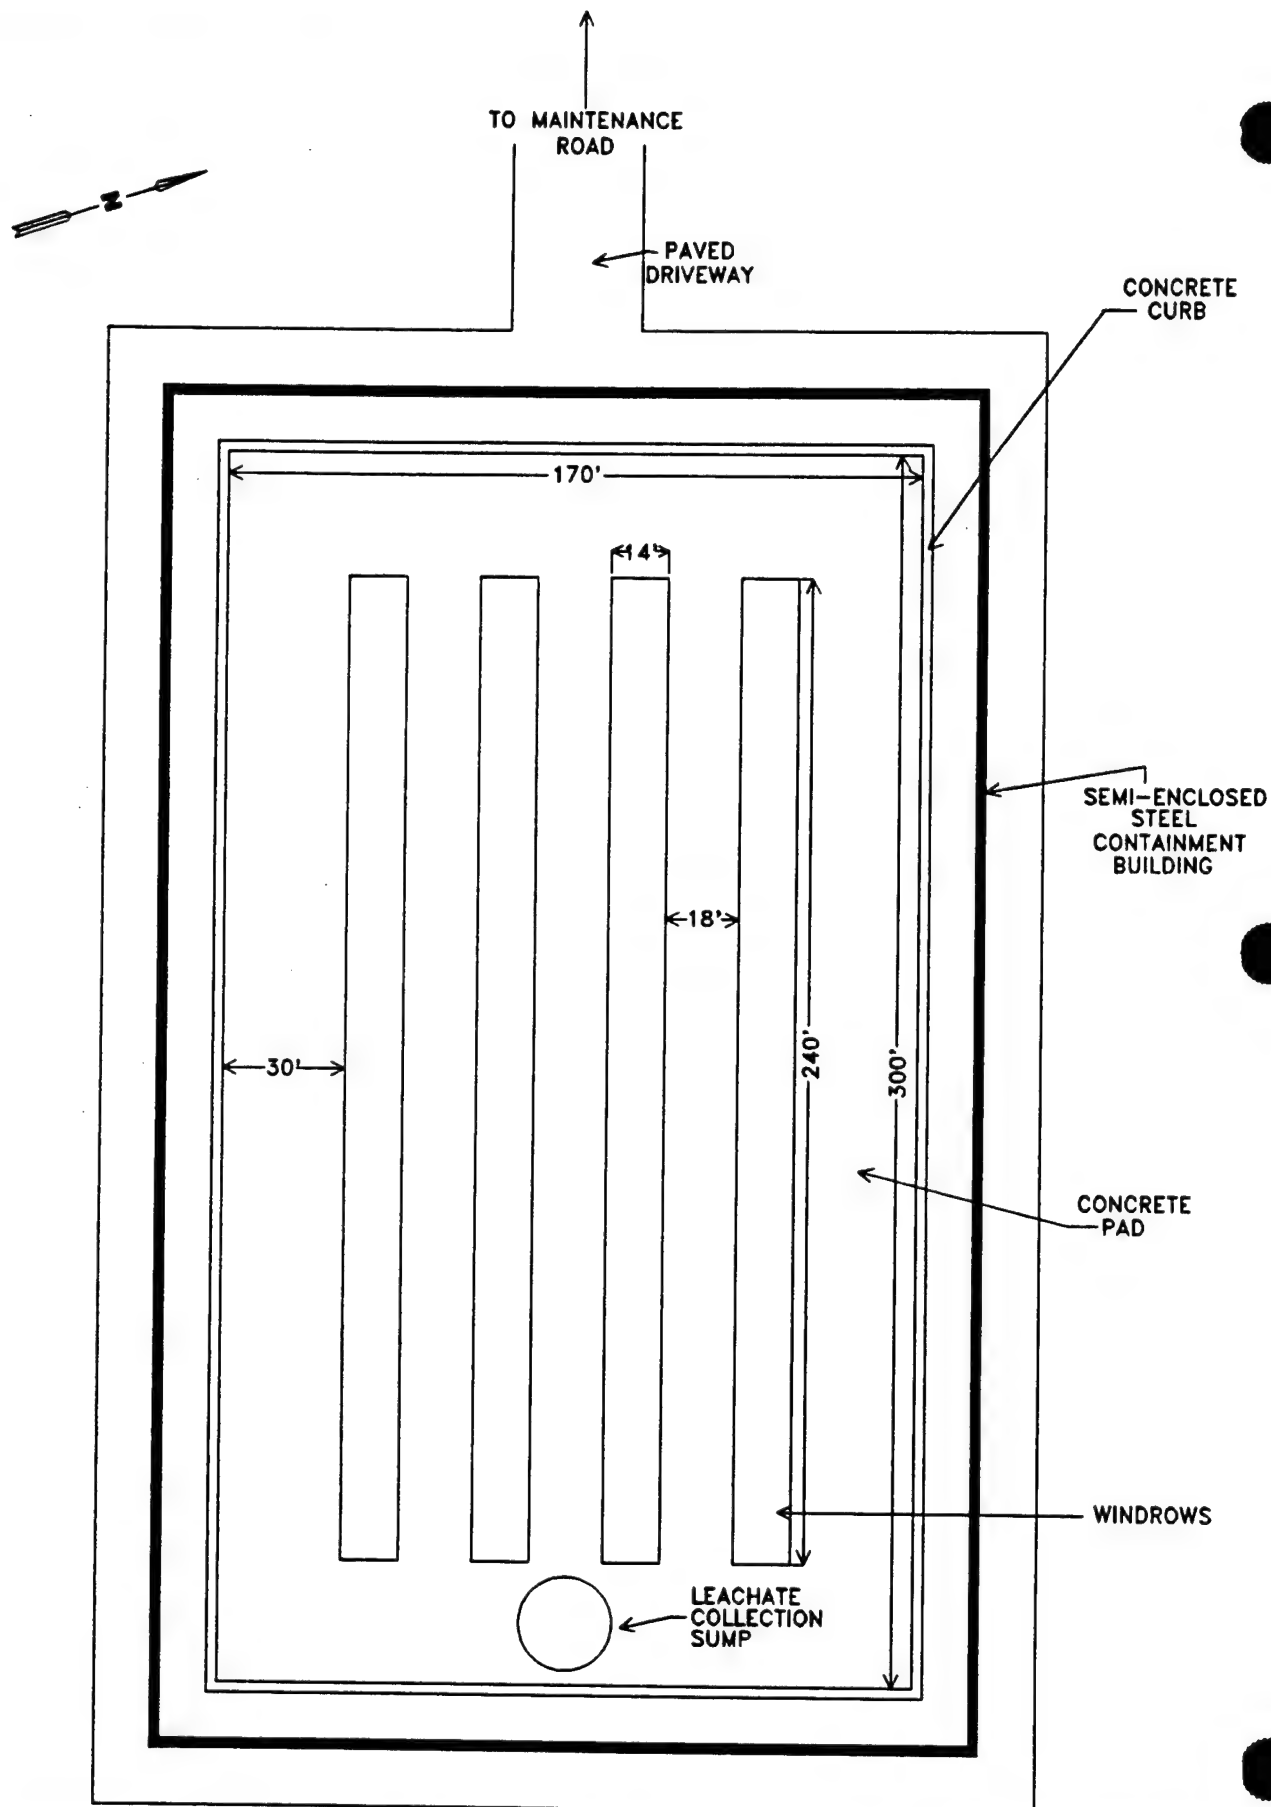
WINDROW COMPOSTING BUILDING SITE LAYOUT
